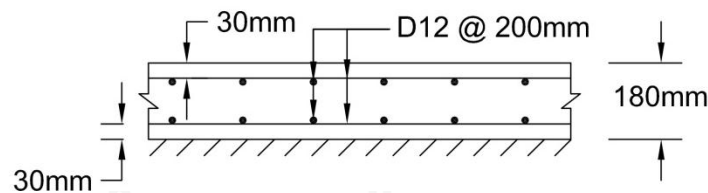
Cross-Section Detail and Reinforcement of Slab in Project-A
